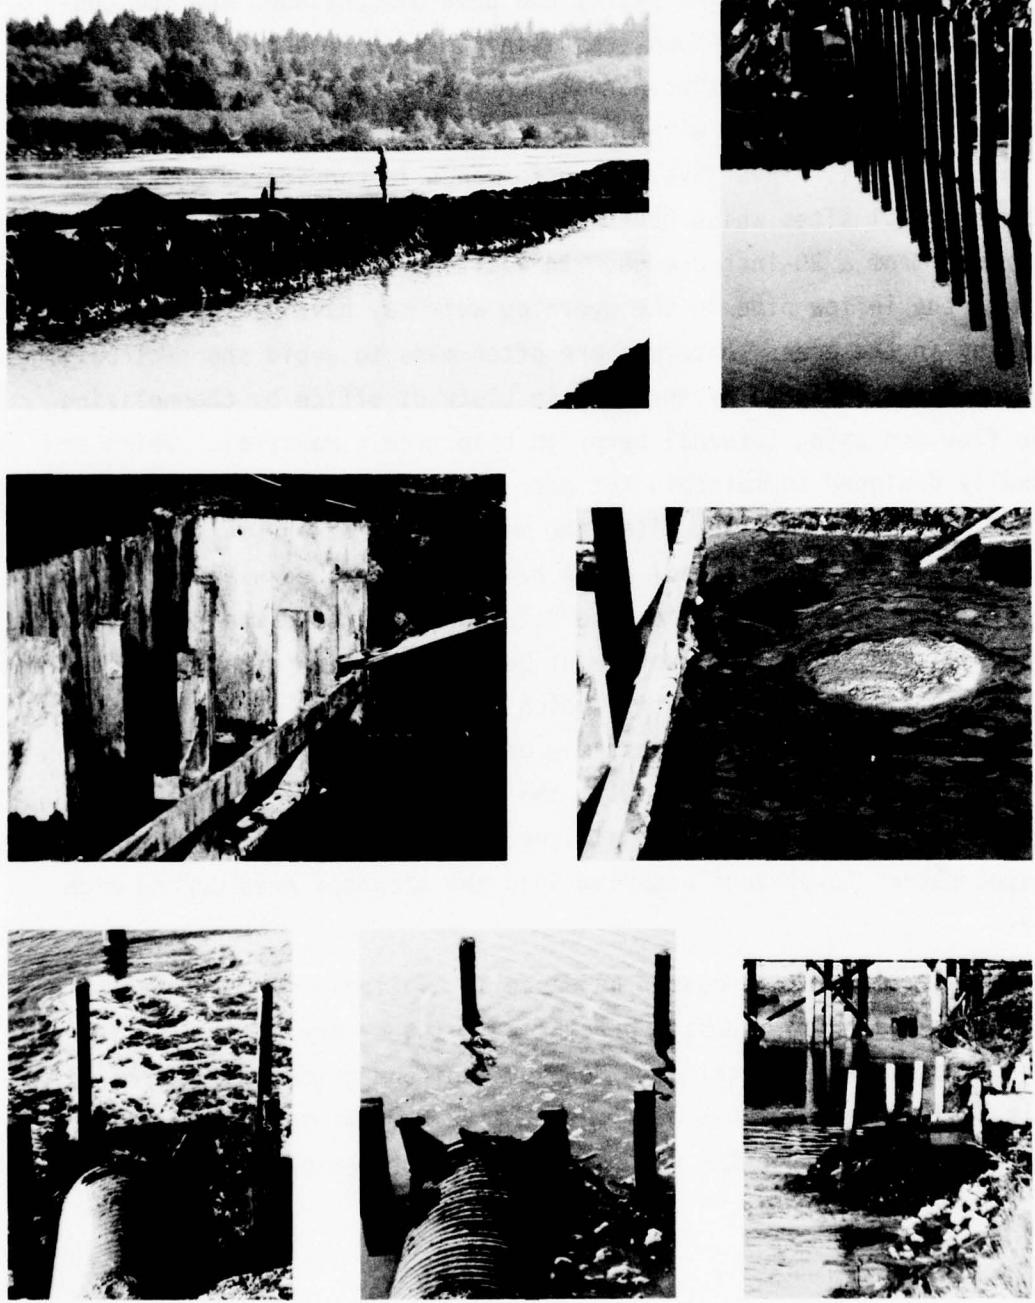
Photos of disposal area 6F at Willapa Harbor, Washington
